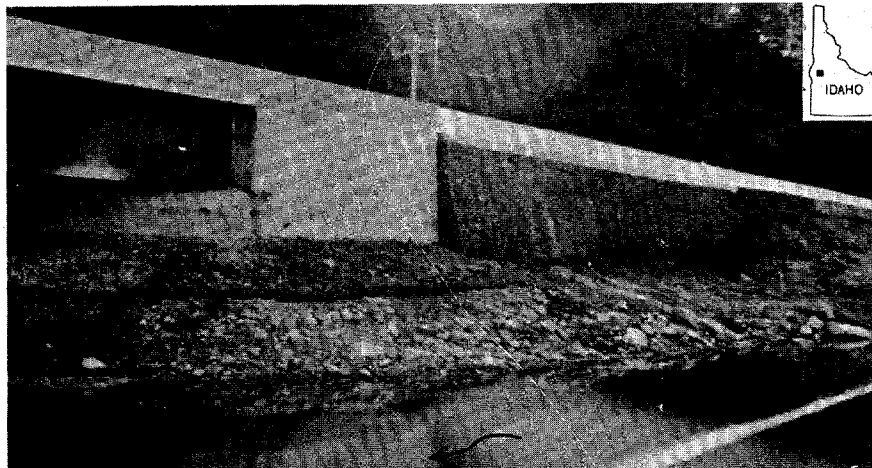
View of upstream right bridge abutment and embankment showing gabion revetment. (From Idaho Dept. of Transportation, 1975.)
